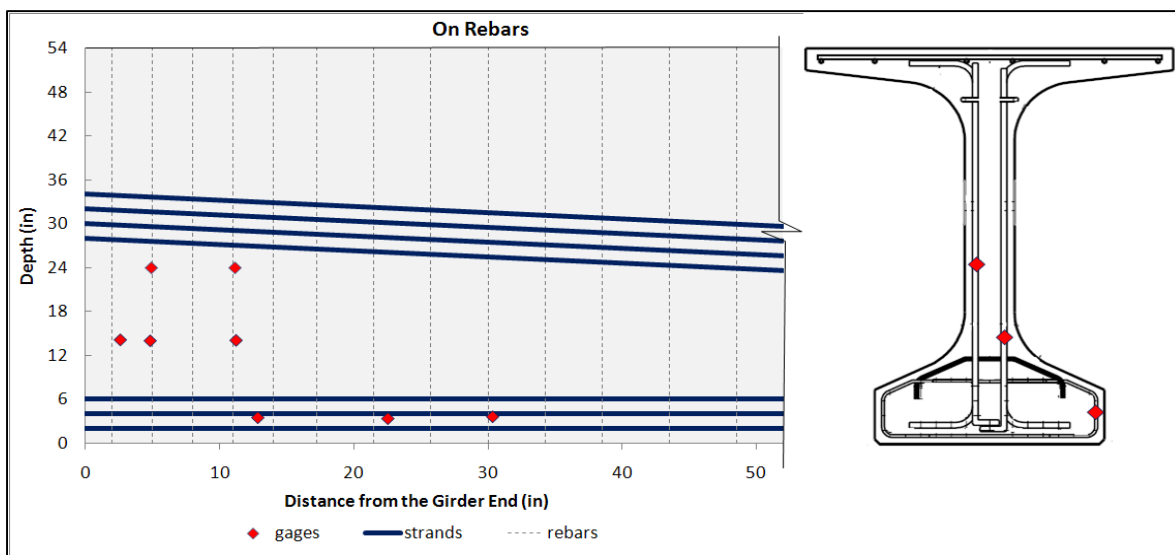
Locations of strain gages on the rebars shown on elevation view (left) and cross section view (right).
